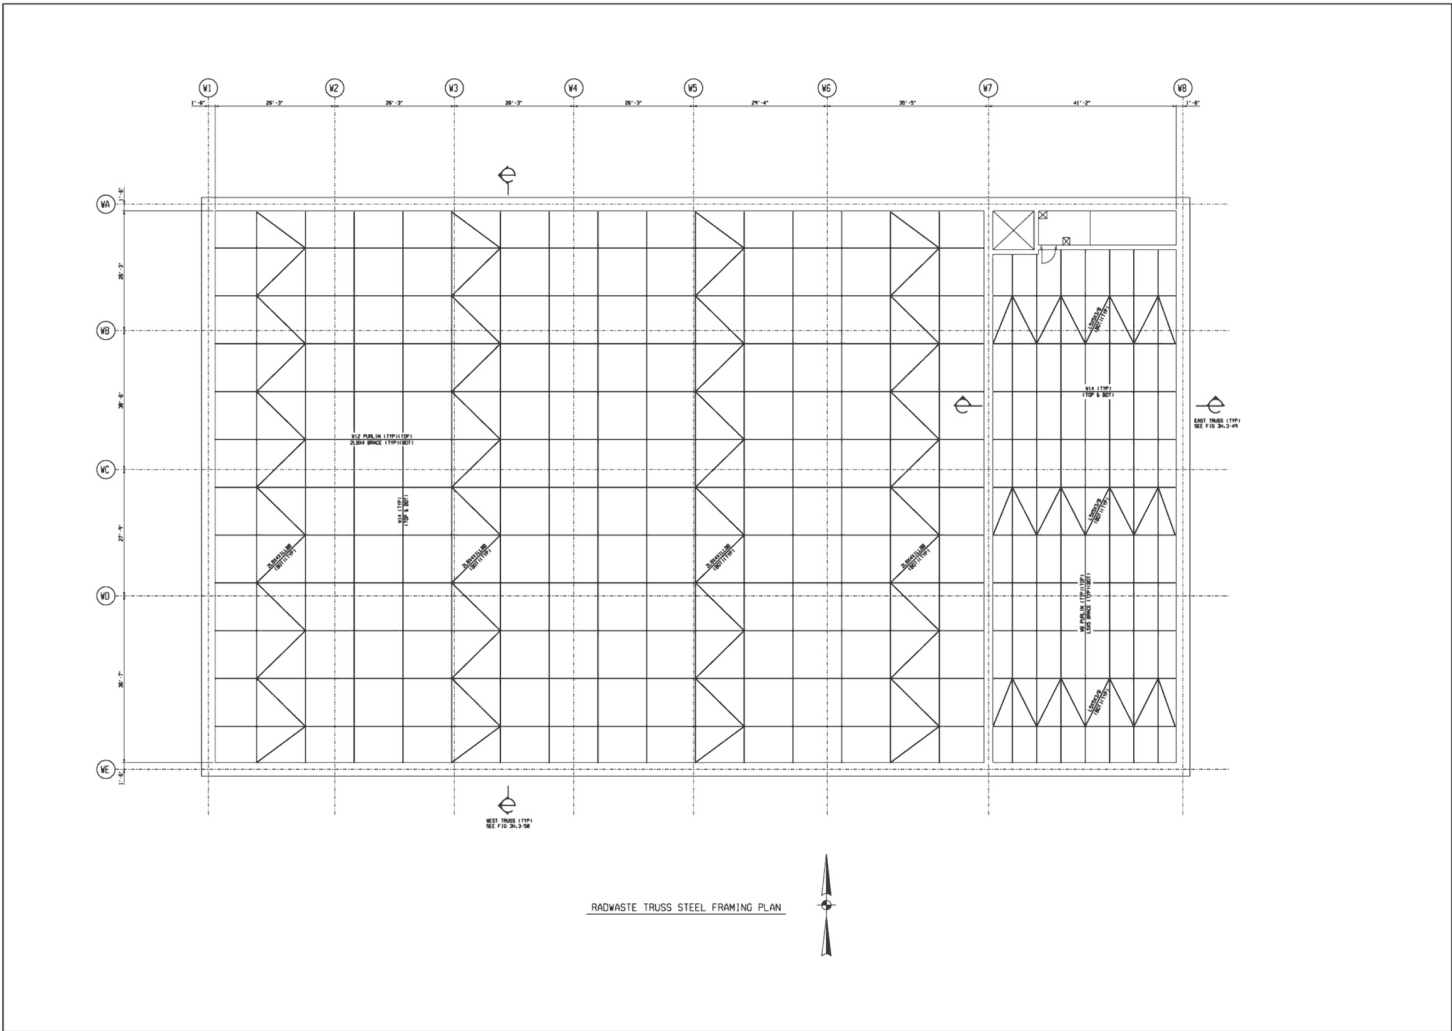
H.3-47 Roof Truss. Purlin and Horizontal Bracing Layout (Plan View)
